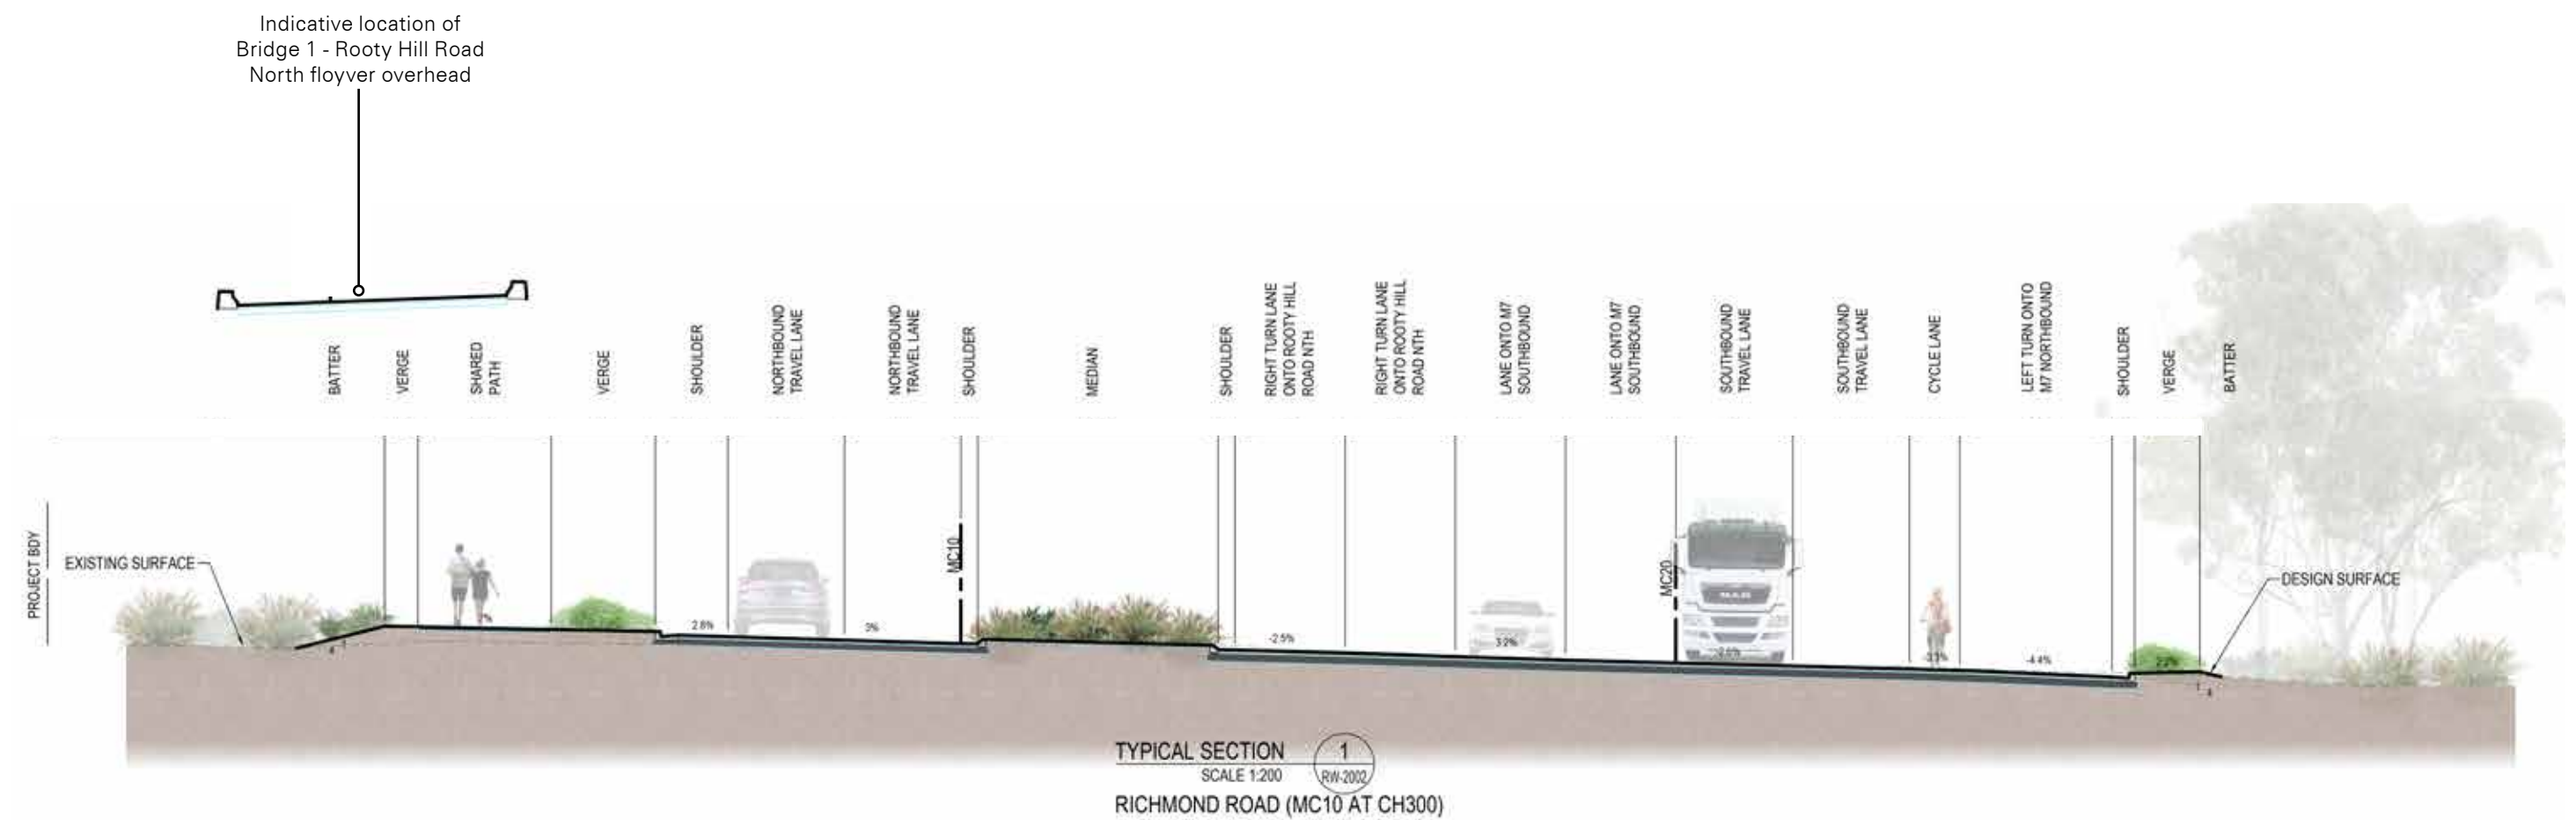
Cross section 1 through Richmond Road at CH300, looking north: near the intersection with Rooty Hill Road north, where Bridge 1 (flyover) sweeps across the shared path alongside the Blacktown Native Institution site
